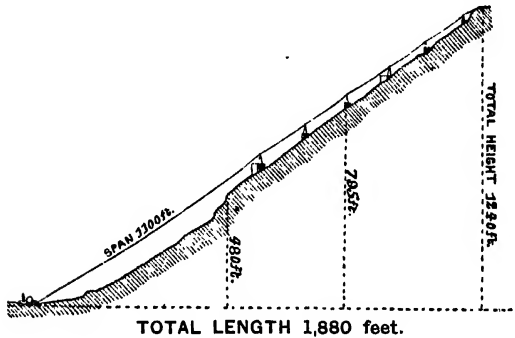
Installation at Fortifications, Gibraltar: Section.
